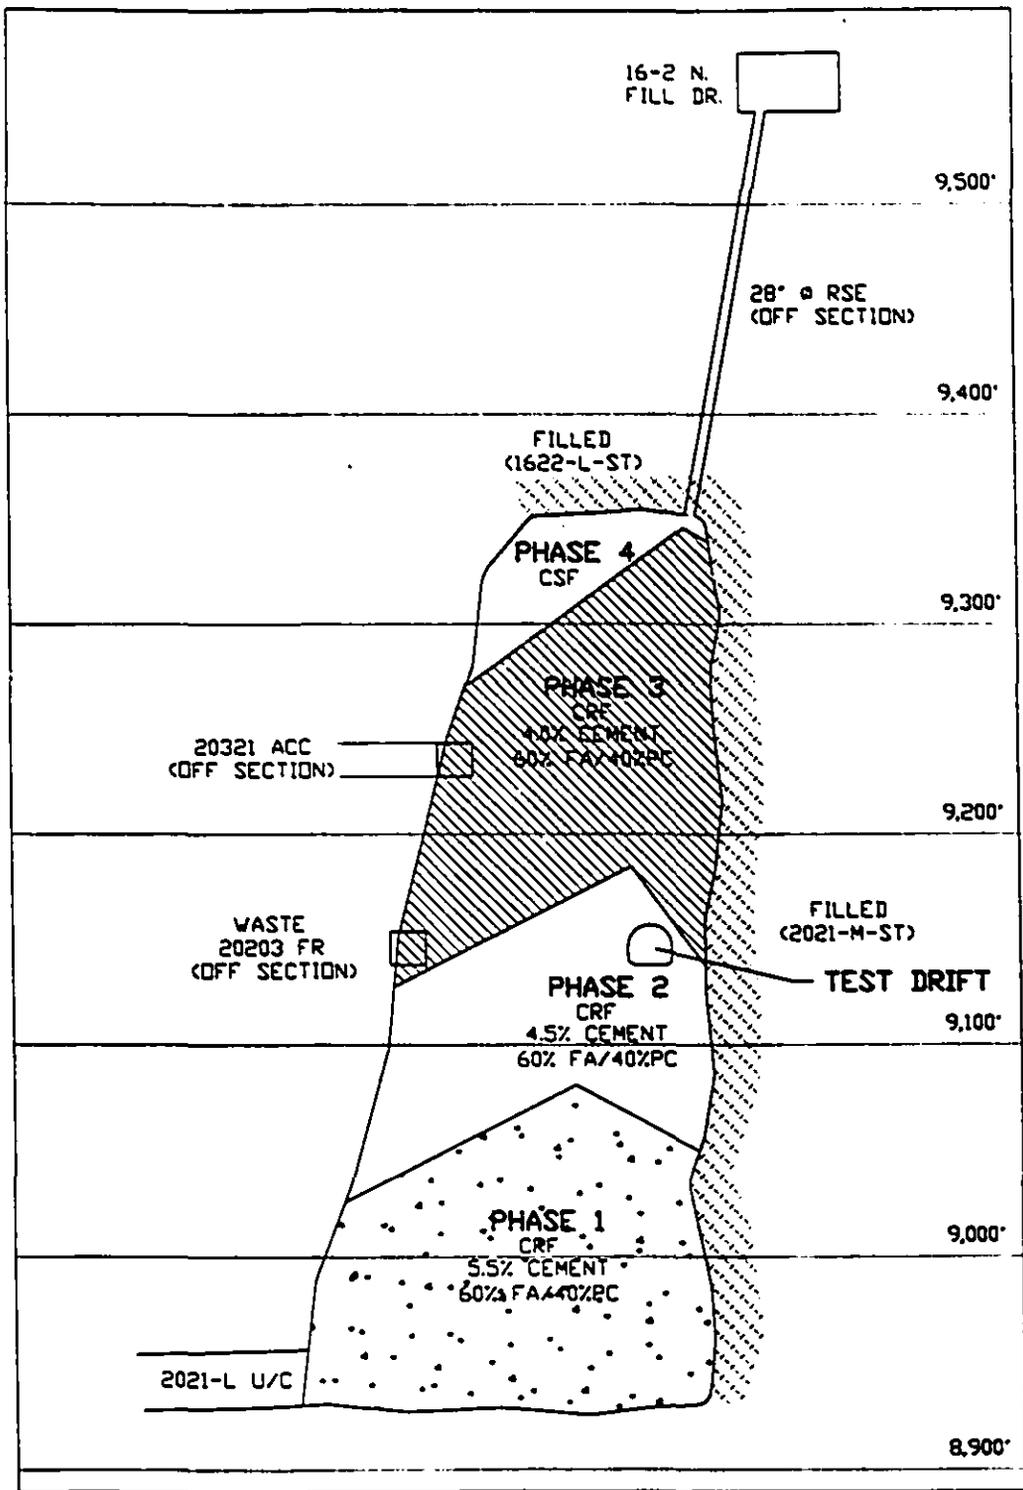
2021-L-ST LOOKING NORTHWEST
